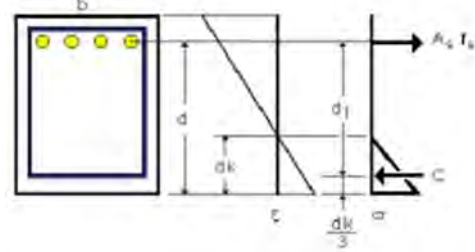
Stresses on the Cross Section for Service Loads of 0 Degree Skewed ITBC
